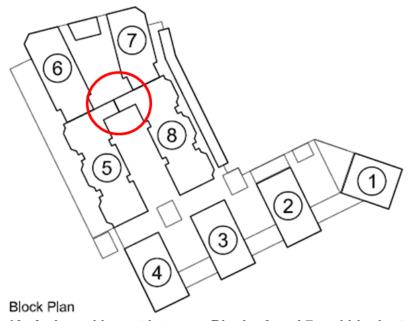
Awkward layout between Blocks 6 and 7 and blocks to south
